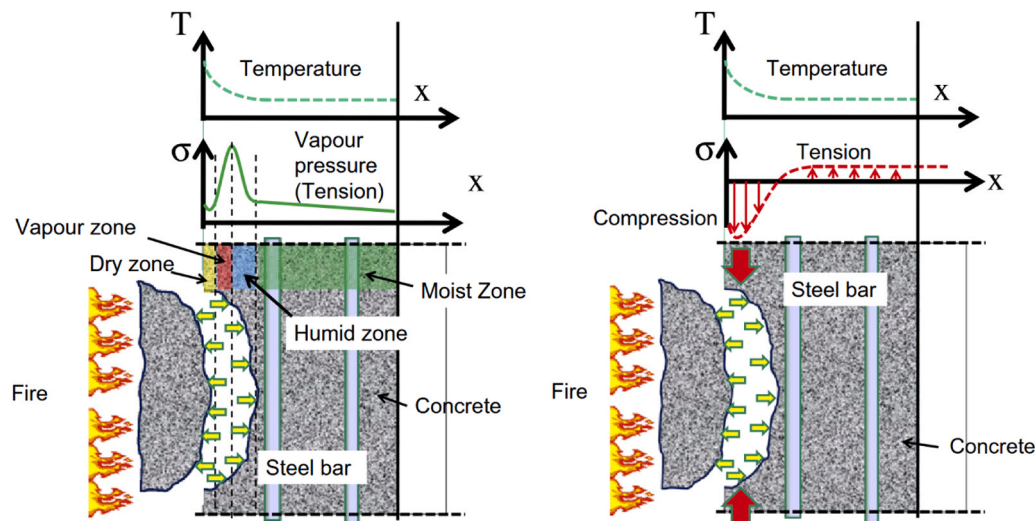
Schematic diagram of the two fire-induced concrete spalling mechanisms [37].
